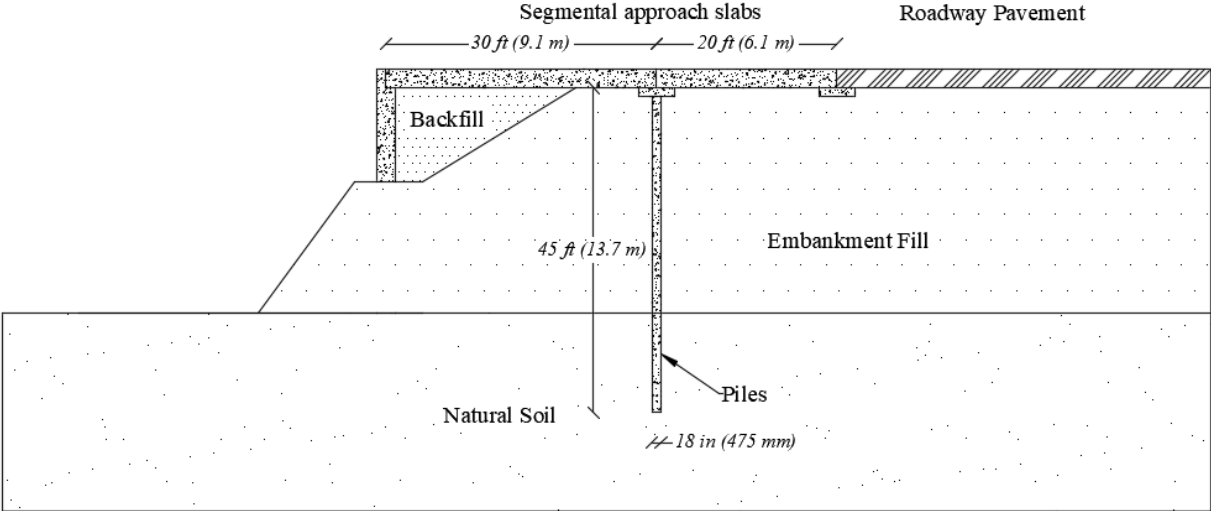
Longitudinal cross section of the proposed two-segment pile-supported approach slabs
